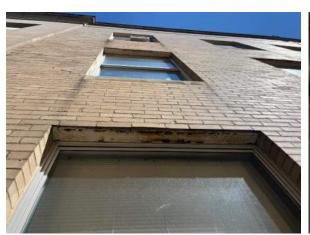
Typical rusted lintel above window Figure 11: Broken CMU at window infilll. location with peeling/blistered paint.
